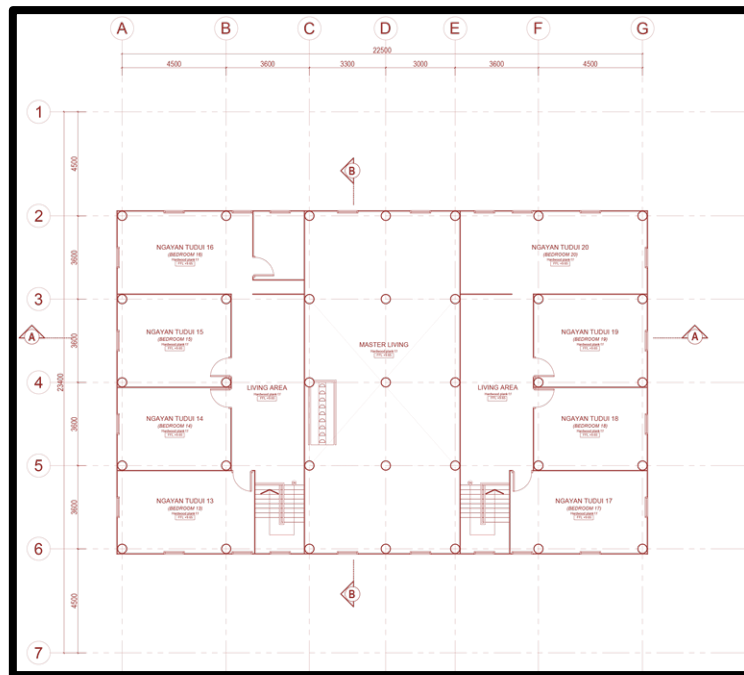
The Melanau Tall Longhouse, Upper Level Floor Plan.
